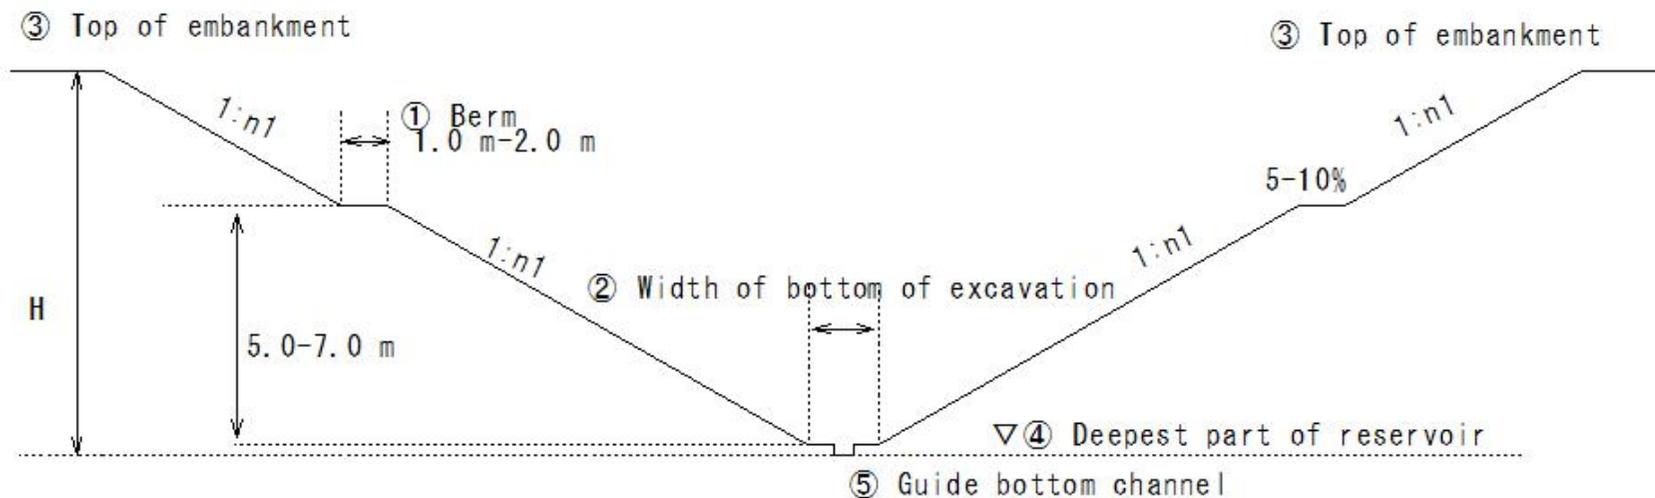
Example of embankment cut cross section when berm is provided
